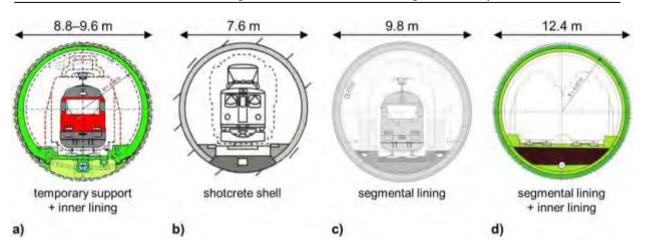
Typical standard cross-section of TBM tunnels: a) gripper TBM, double-shell lining (Gotthard Base Tunnel, Switzerland) [9]; b) gripper TBM, single-shell lining (Vereina Tunnel Switzerland) [10]; c) shield TBM, single-shell lining (Follo Line Tunnel, Norway) [11]; d) shield TBM, double-shell lining (Zimmerberg Base Tunnel, Switzerland) [12].
